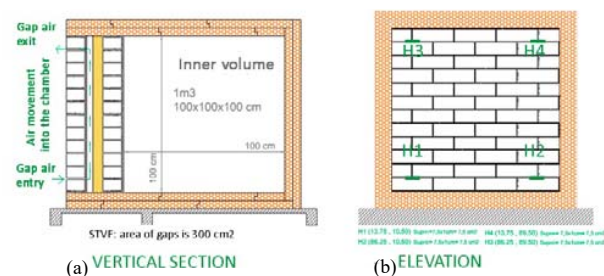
Scheme of Strongly Ventilated Façade. $A_{ef} = 1000 \text{ mm}^2$. (a) vertical section and (b) elevation
